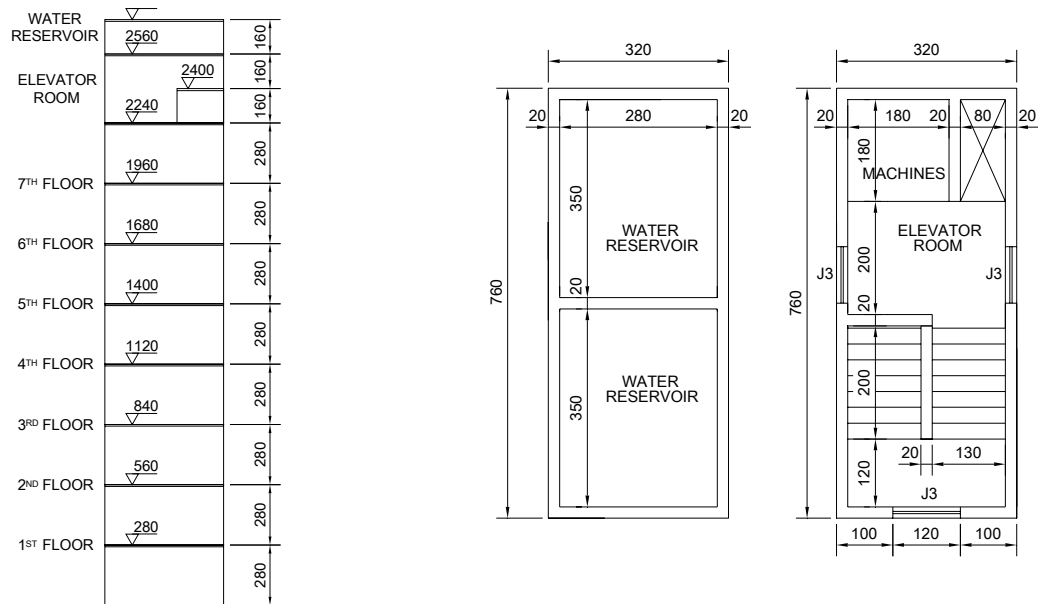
Vertical layout and plan view of water reservoir and elevator room of the building (Ramalho and Côrrea, 2003 - dimensions in cm).
